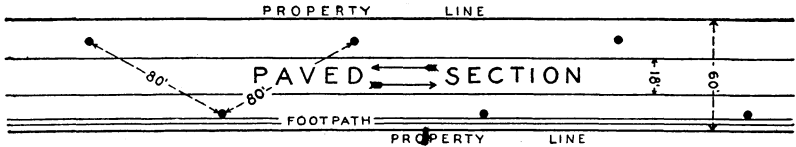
A 60-foot right of way with an 18-foot improved road and formally planted trees with 40 feet between the tree rows and 80 feet between the trees that are nearest one another.
